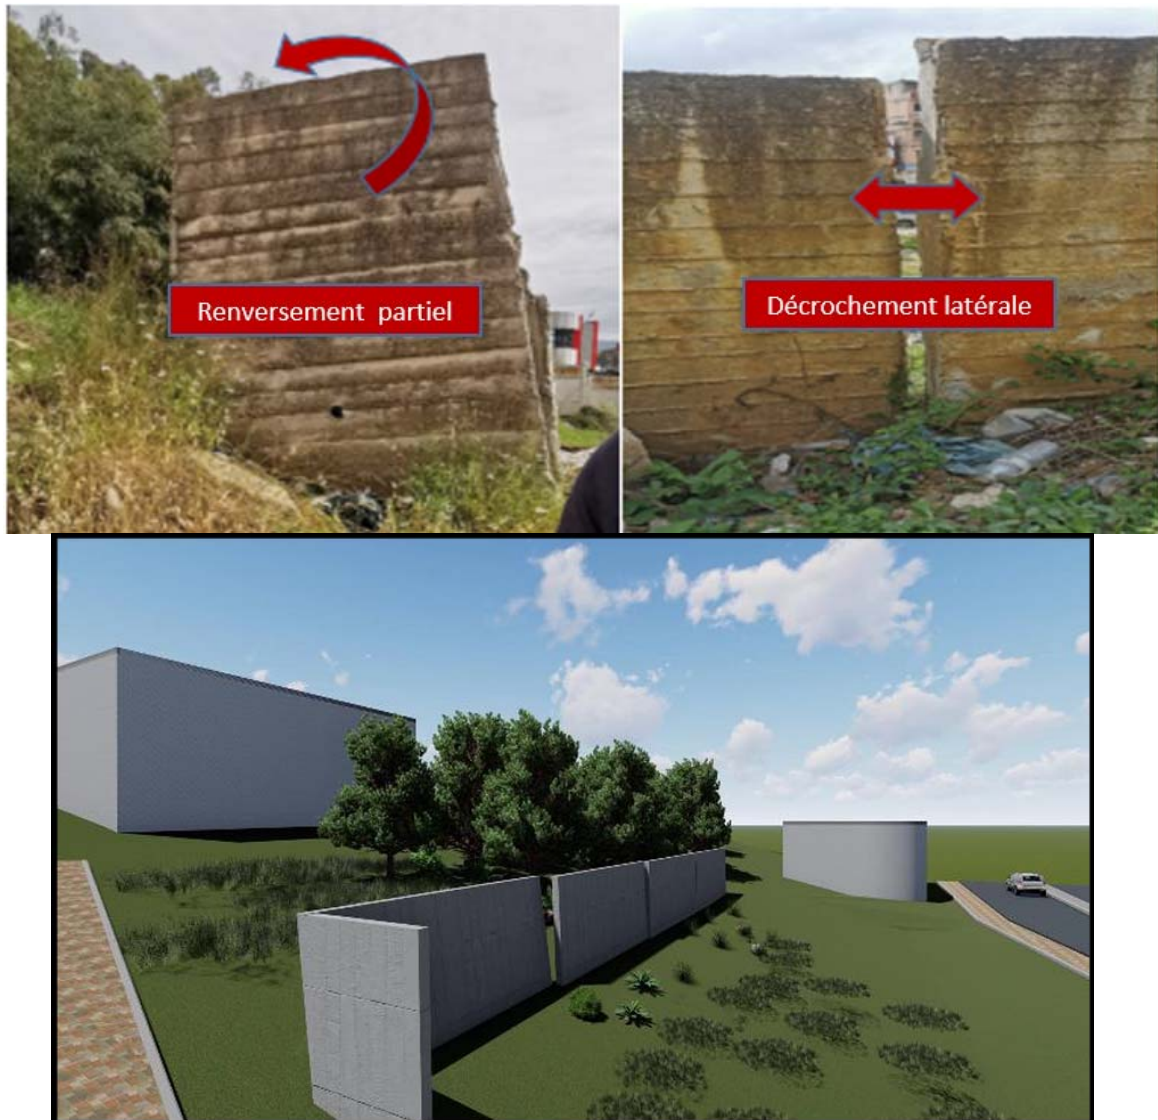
a) deformation on the retaining wall (partial overturning and lateral detachment) b): 3D photo of the site.
